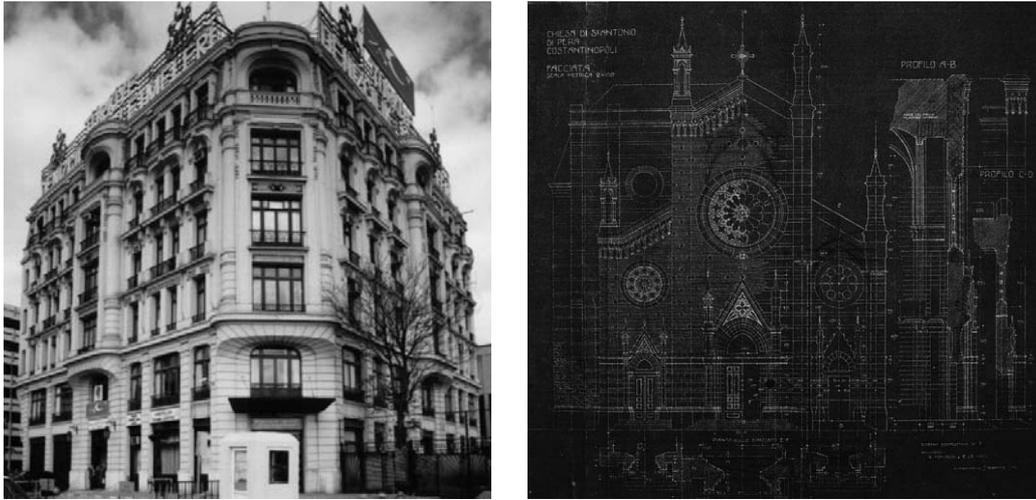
Merkez Rıhtım Khan (1912), one of the first buildings constructed with iron-concrete construction technology (U.Yergün). Sant'Antoine Church (1910), one of the first buildings constructed in reinforced concrete construction technology, entrance facade part plan and section (Can & Girardelli 1996)
